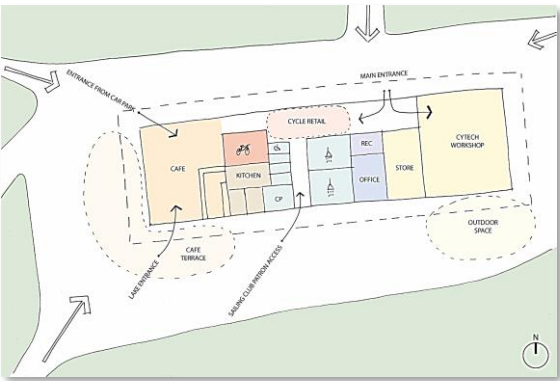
Bike Park hub building proposed configuration and schedule of accommodation
